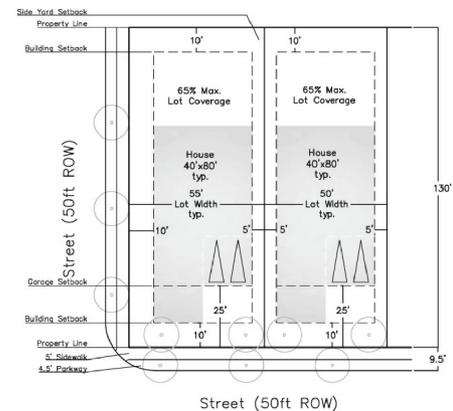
EXHIBIT J – Typical Building Lot Setbacks and Coverages
